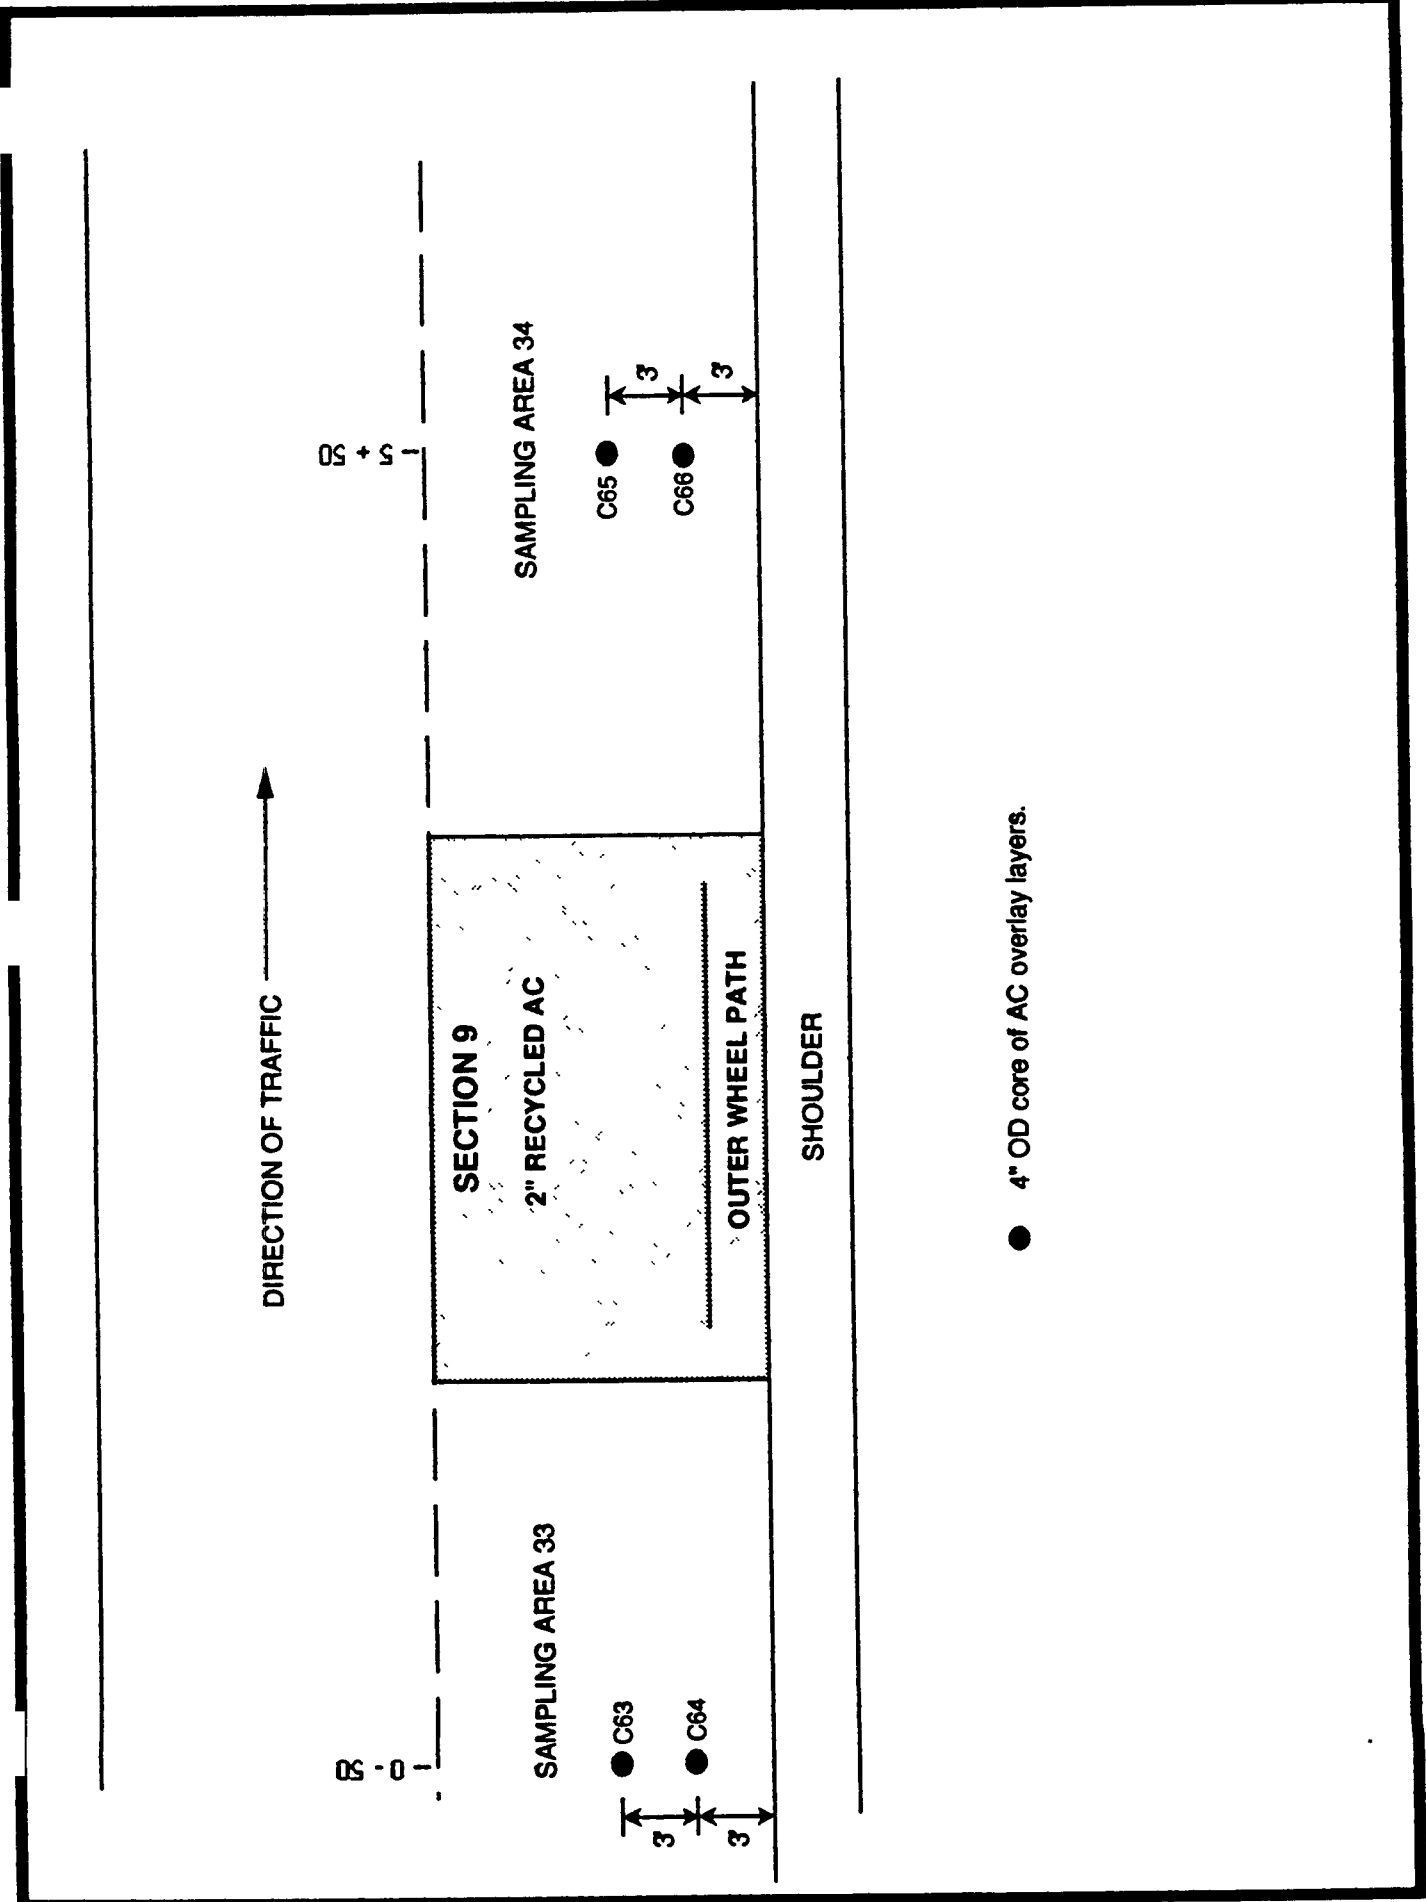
Example of "Post-Construction" Sampling Plan for Section 9.
